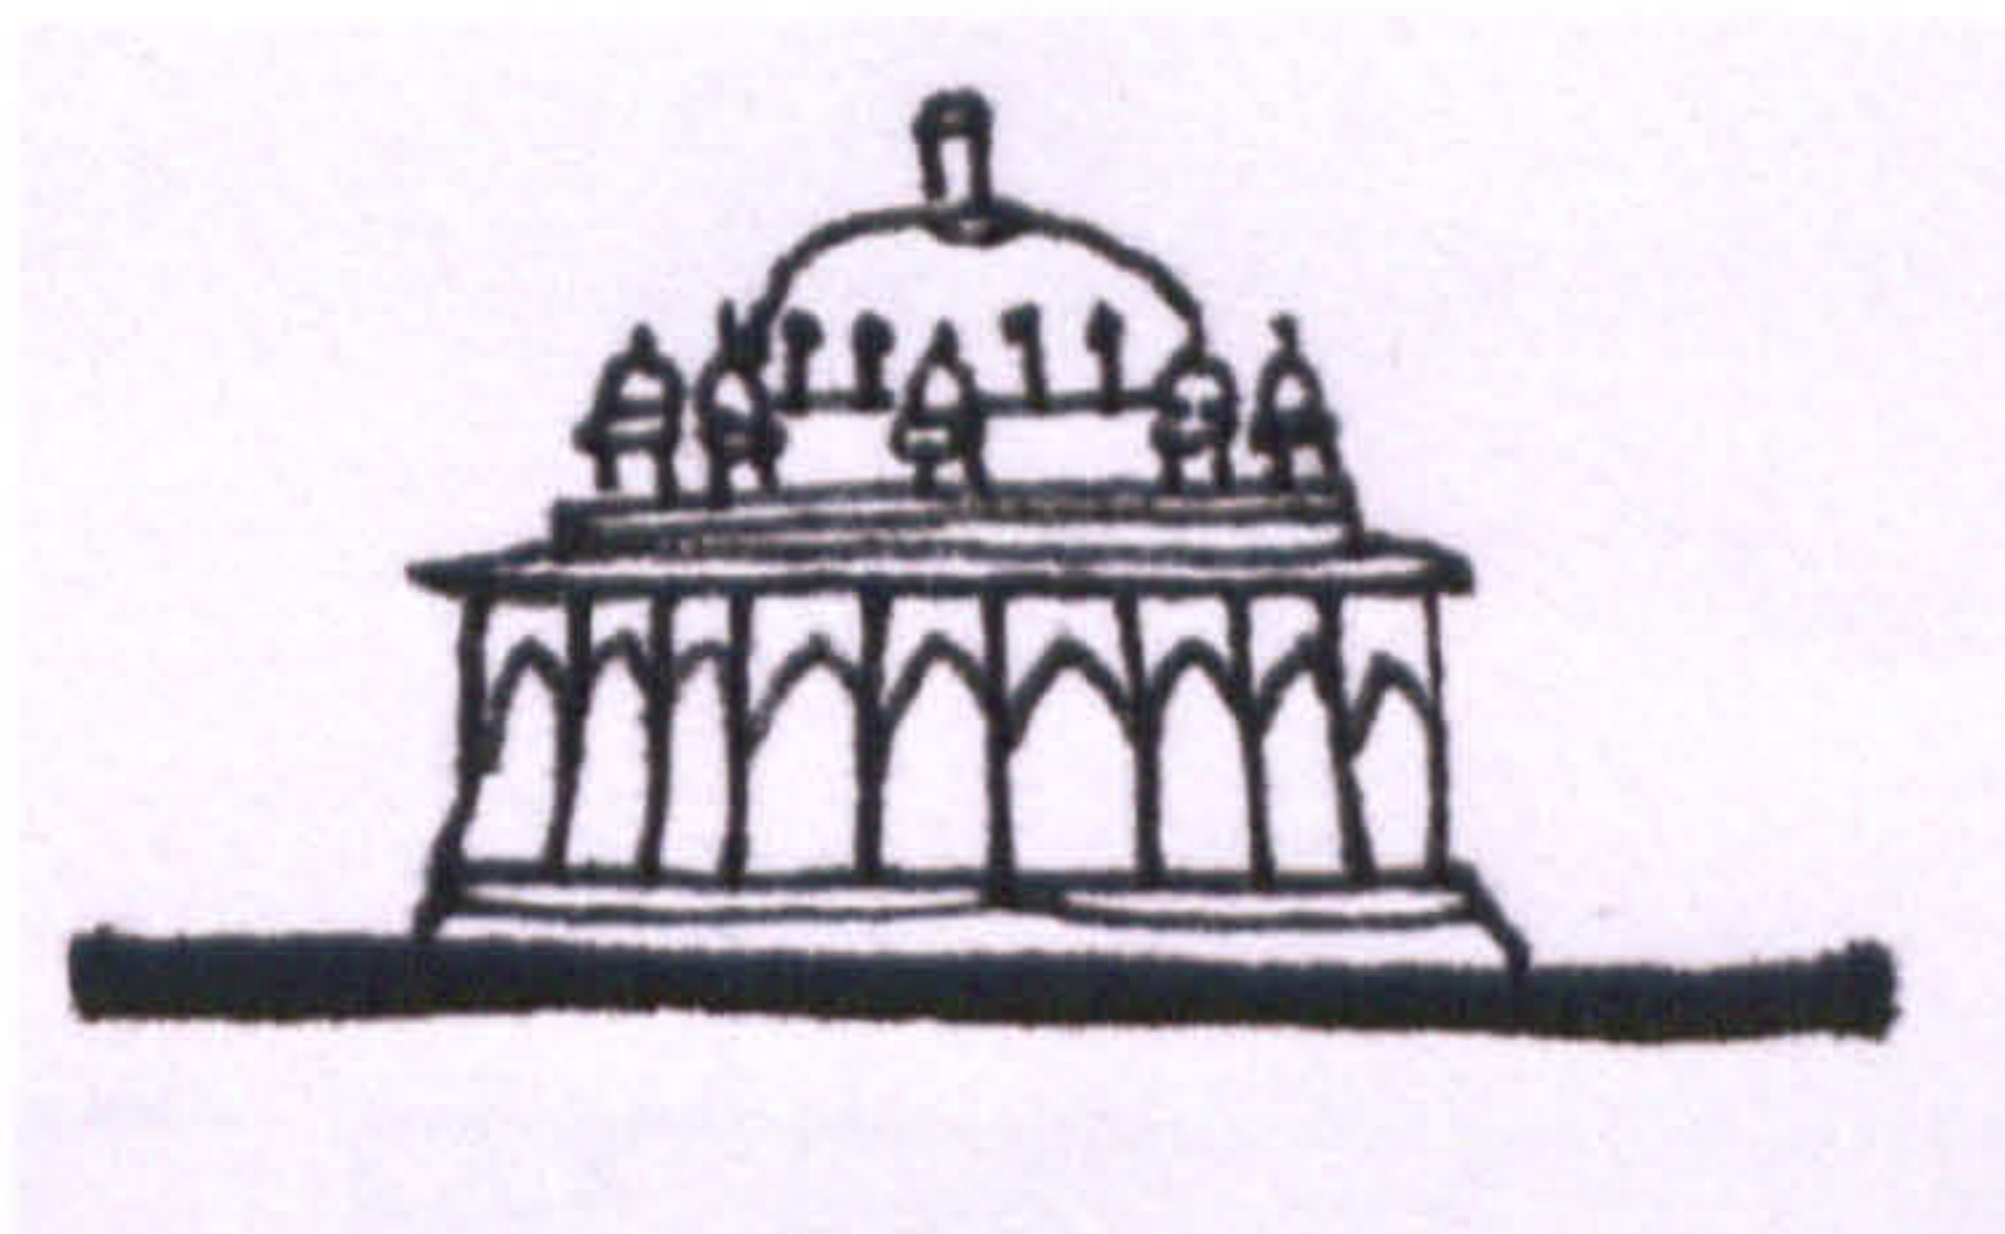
A typical tomb: elevation of an octagonal plan type
